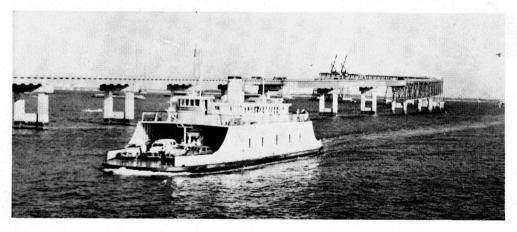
Maryland: Chesapeake Bay Toll Bridge.
